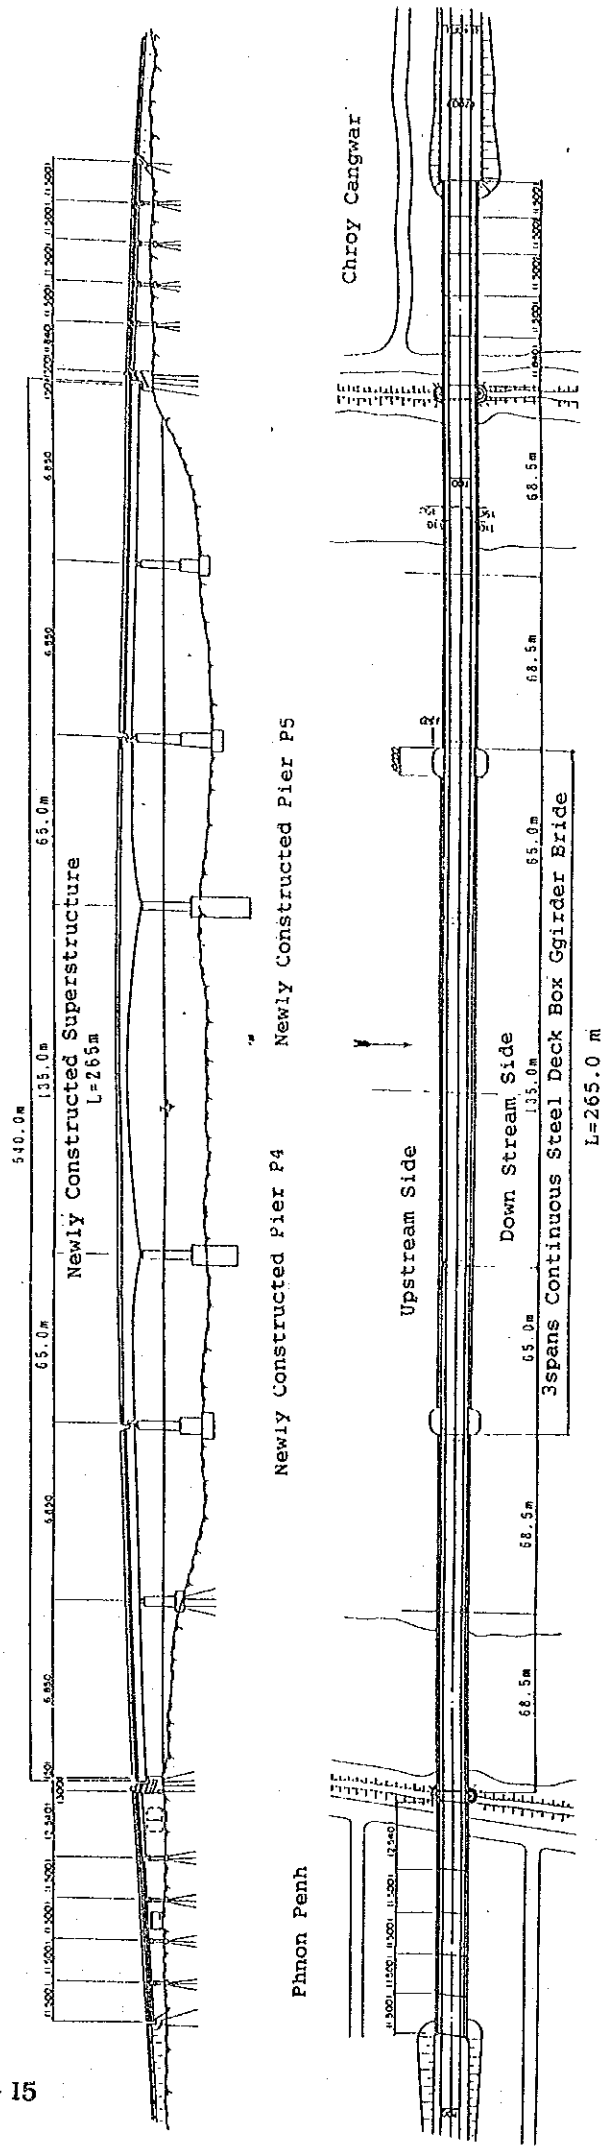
Span Arrangement of the Chroy Changwar Bridge
